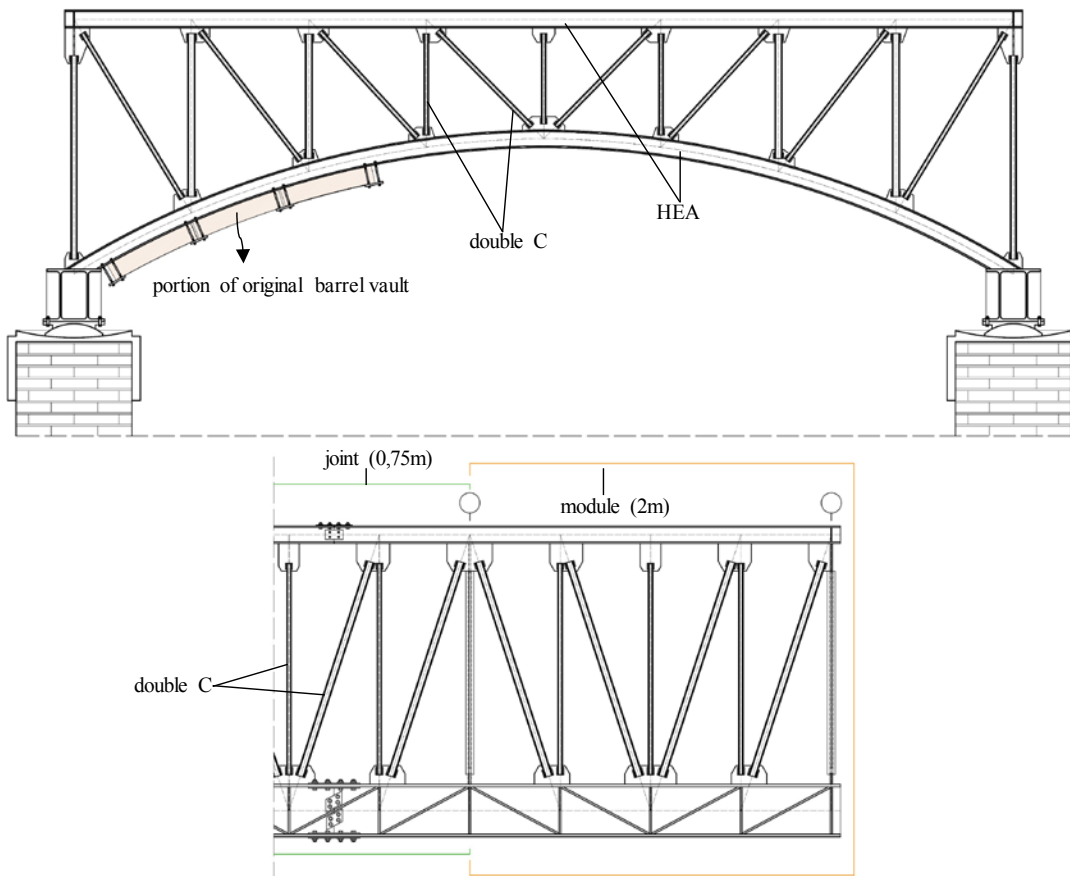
Restoration design of the “Galleria delle volte crollate”: transversal cross section of the steel truss deck and detail of the longitudinal joint between adjacent modules.
